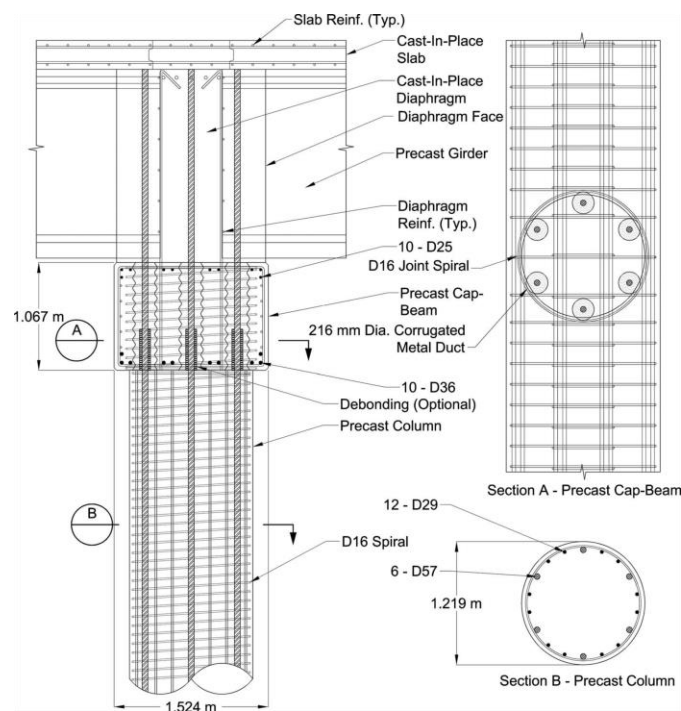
Typical Large Bar Connection Specimen (Stueck et al., 2009; Pang et al. 2008)
